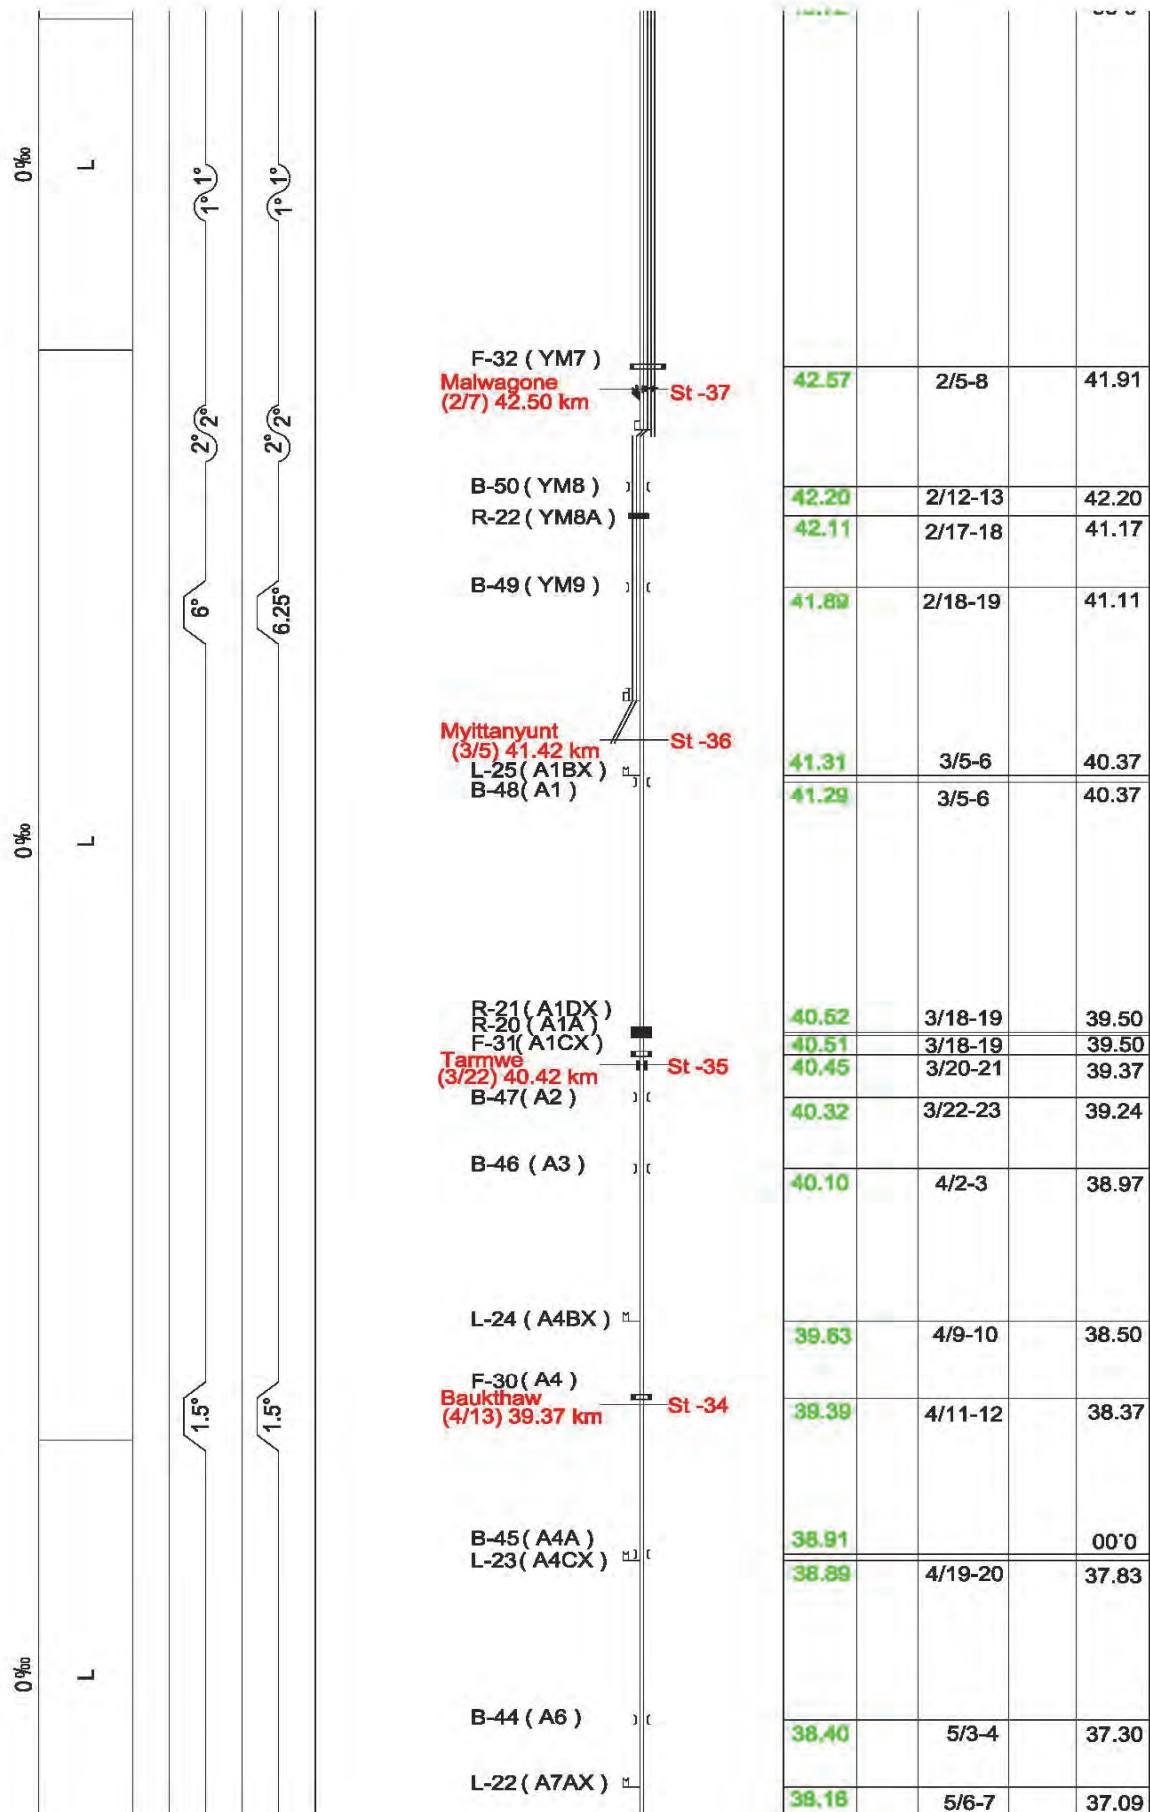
Schematic Sketch on Existing Yangon Circular Railway (8/9)
